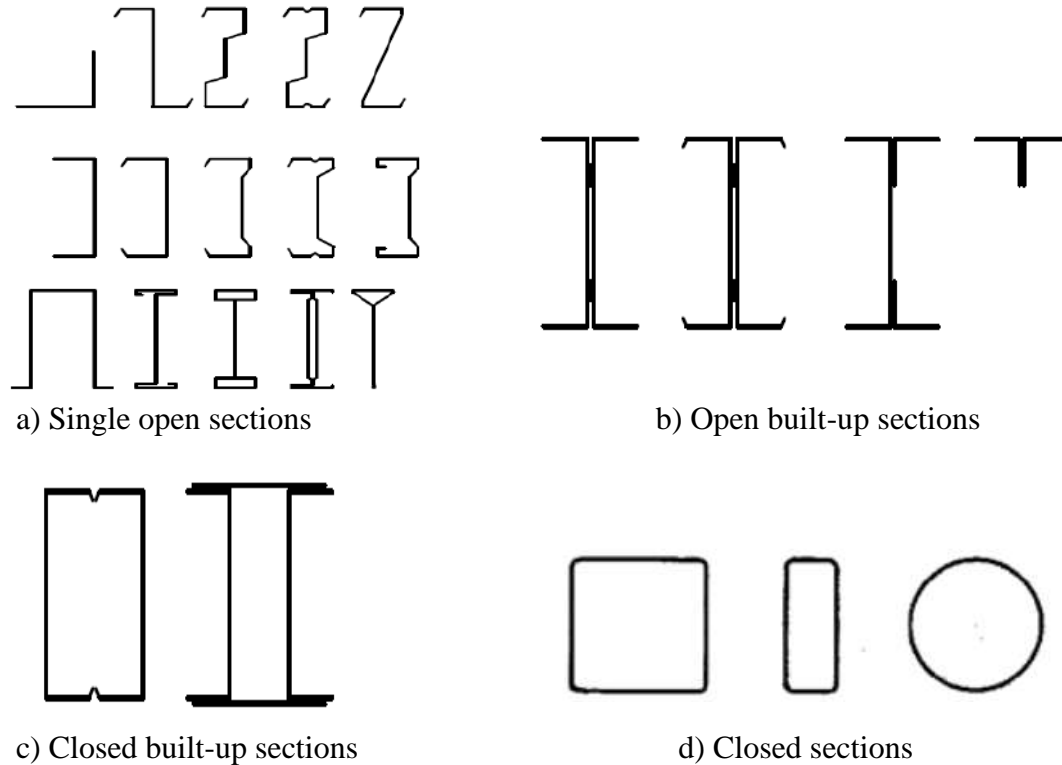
Typical forms of sections for cold-formed structural members [25].
